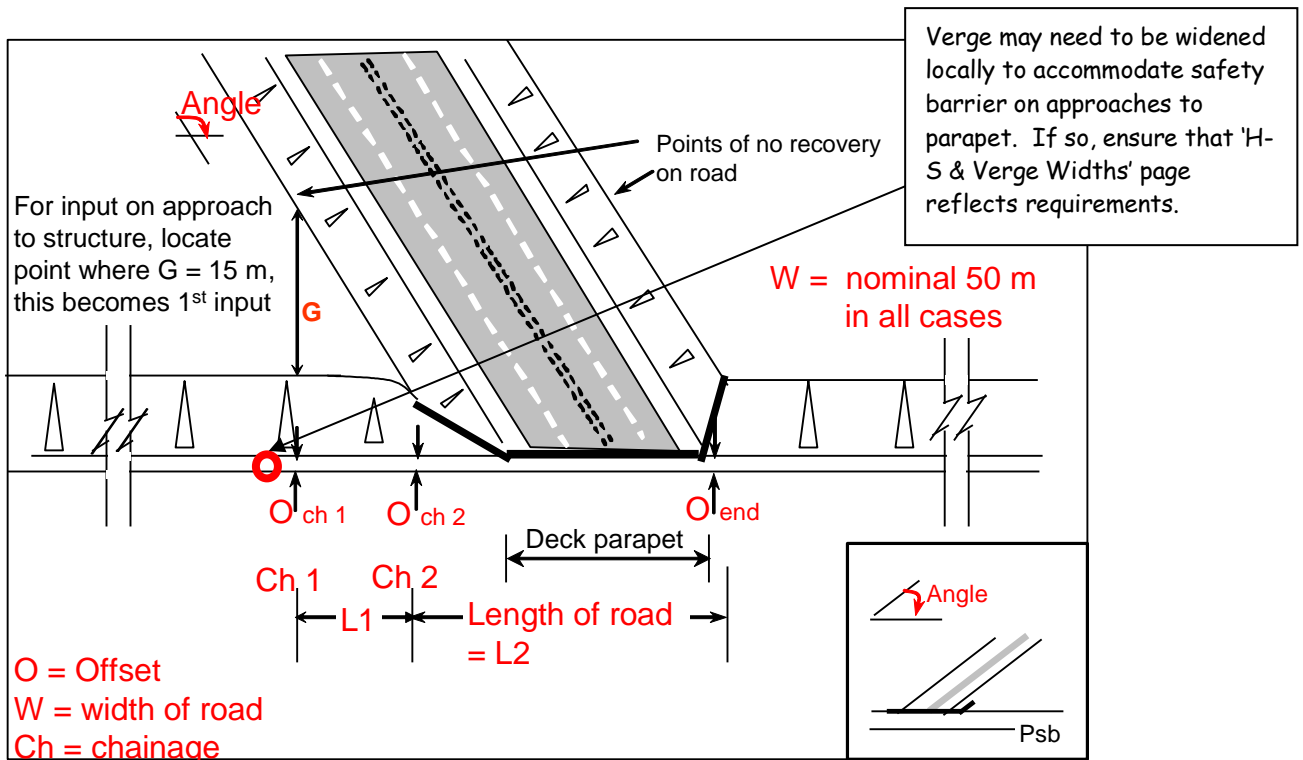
Road crossing under Road at structure with splayed wingwalls
